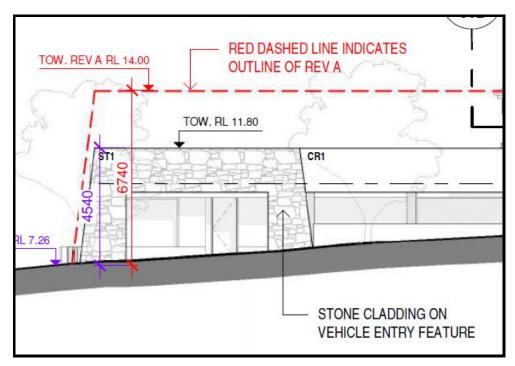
Previous Entry Structure (Source: Innovate, Revision C)
